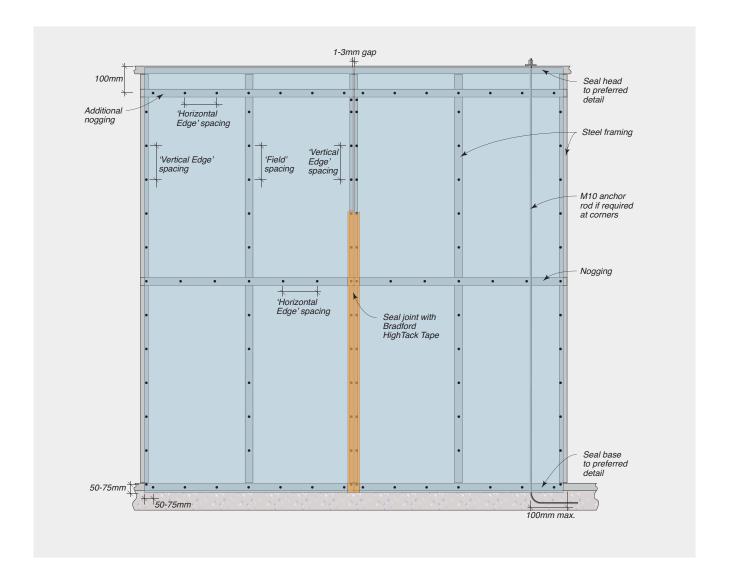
SHEET FIXING FOR STRUCTUAL BRACING - VERTICAL SHEETING - STEEL FRAMING
